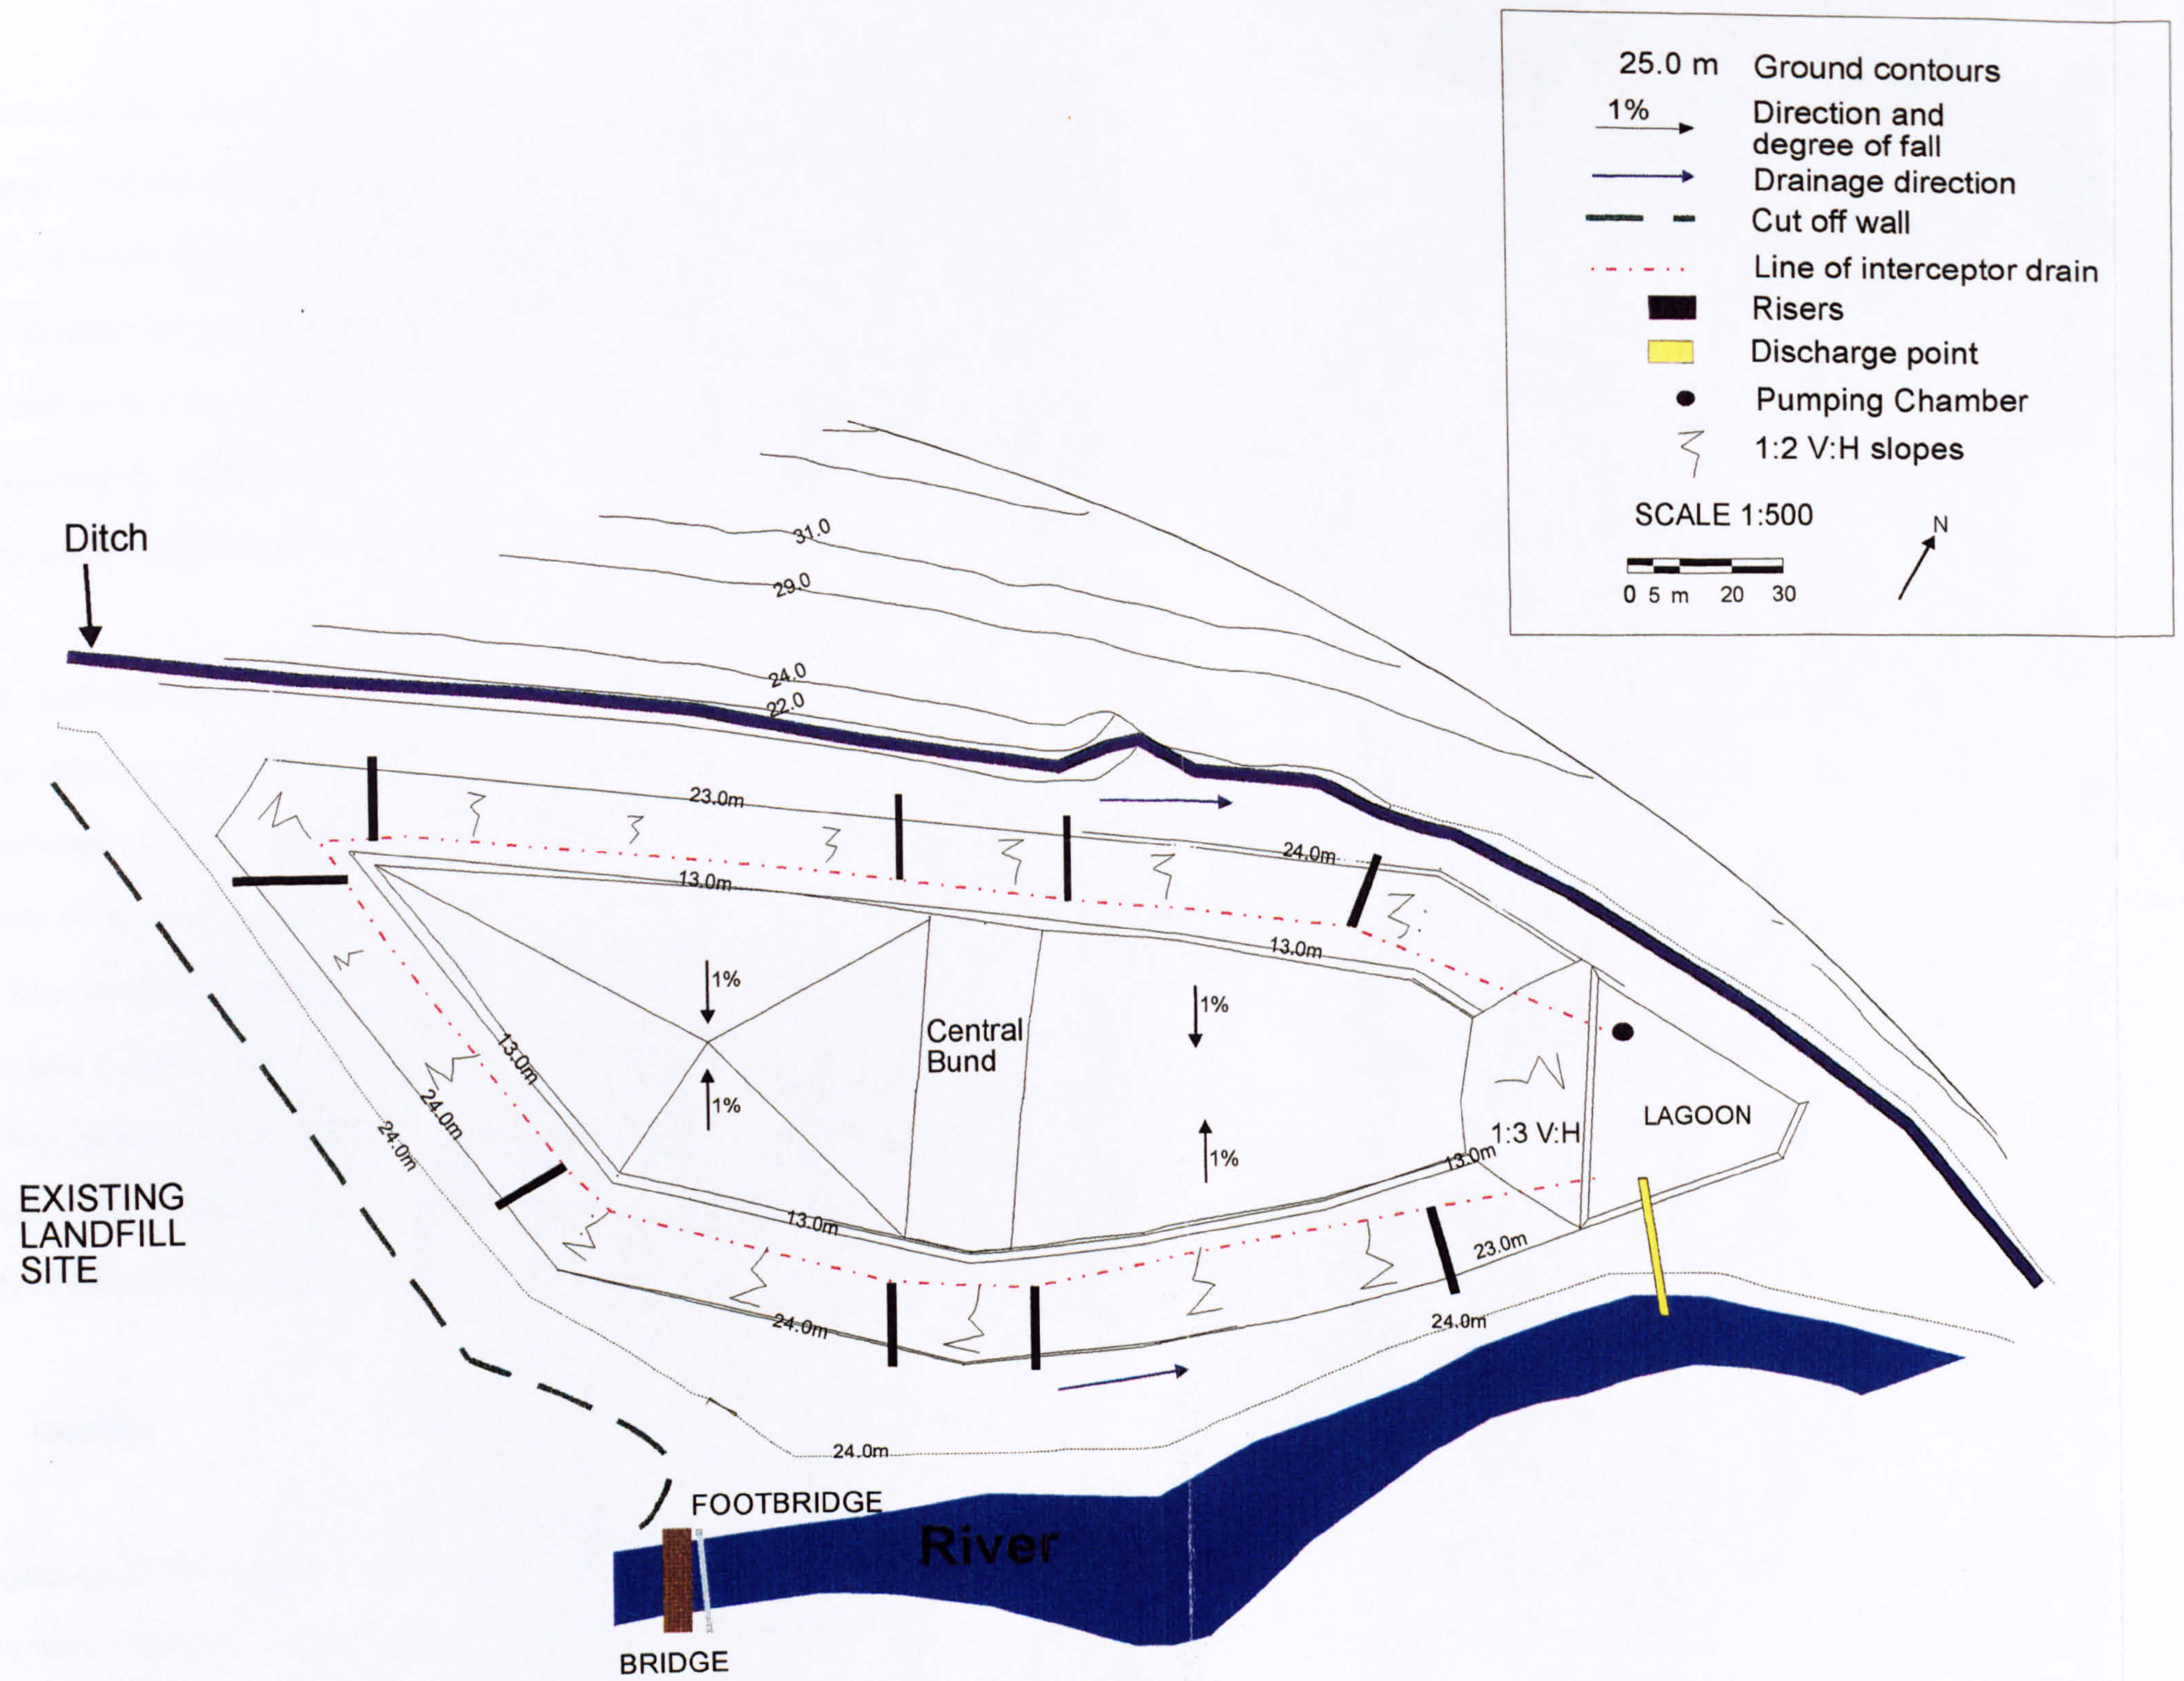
Plan of Site Alpha. (Adapted from Site Construction Plans (CQA, 1995))
